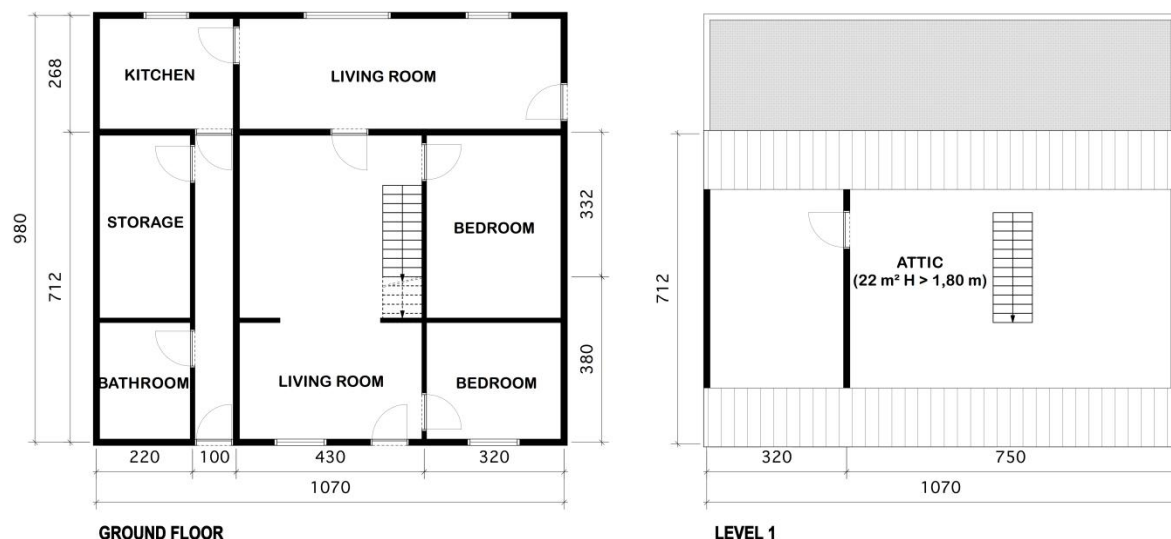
Floor plans of the detached dwelling, type 1 (Allacker 2010, 165)
